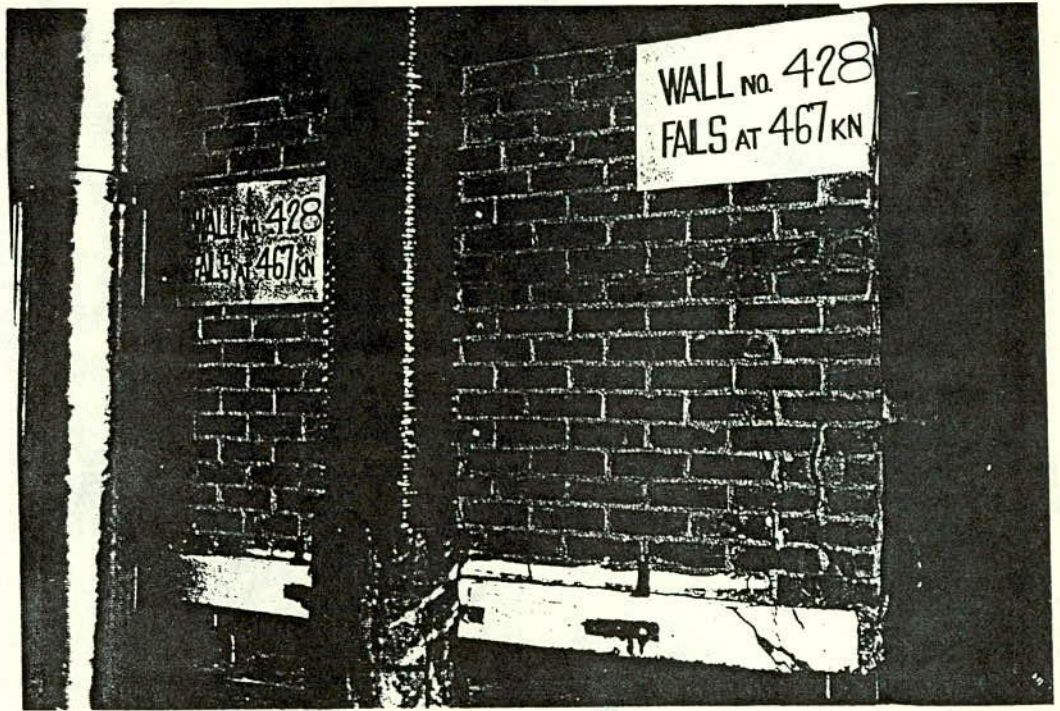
(c) Failure of Plane Wall-beam Panel (back side)
